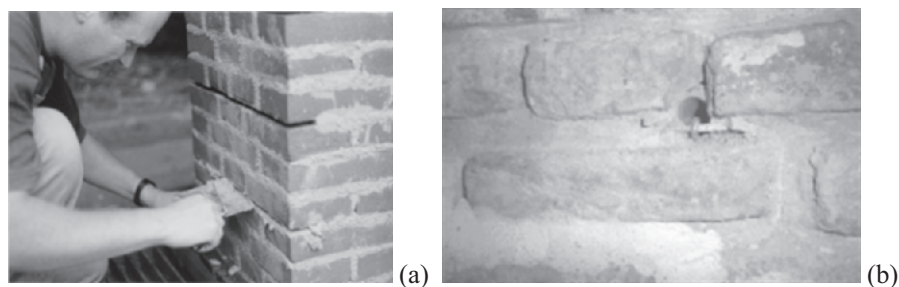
Bed joint reinforcement technique: (a) detail of embedding phase in strengthened joint; (b) arrangement of bar and transverse tie into an excavated joint before final sealing of hole.
